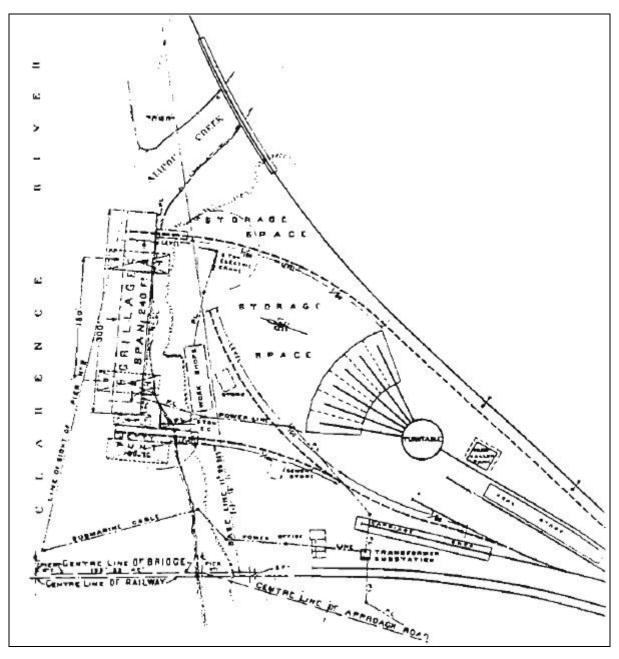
Plan of the construction site for the Clarence River Bridge (source Roberts 1932).
